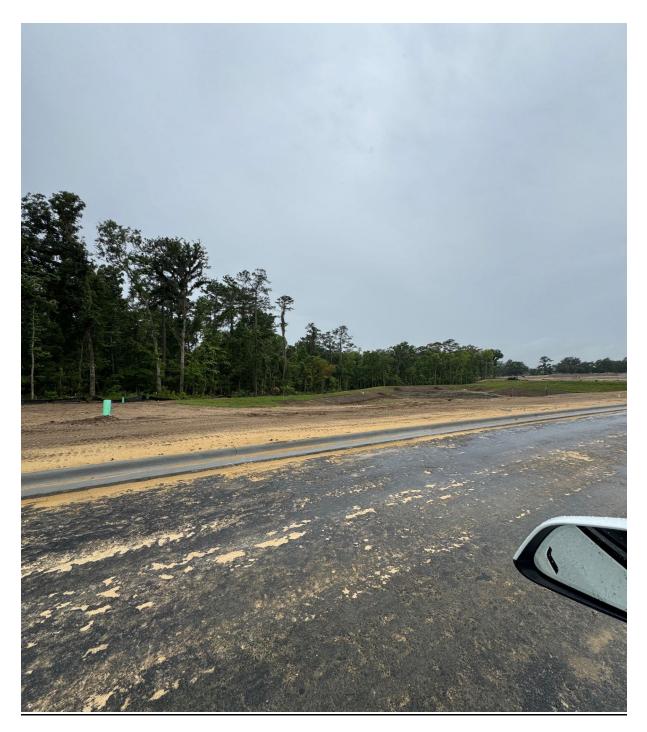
Photo of Retention Area and Conservation Area Southwest of Project Site
